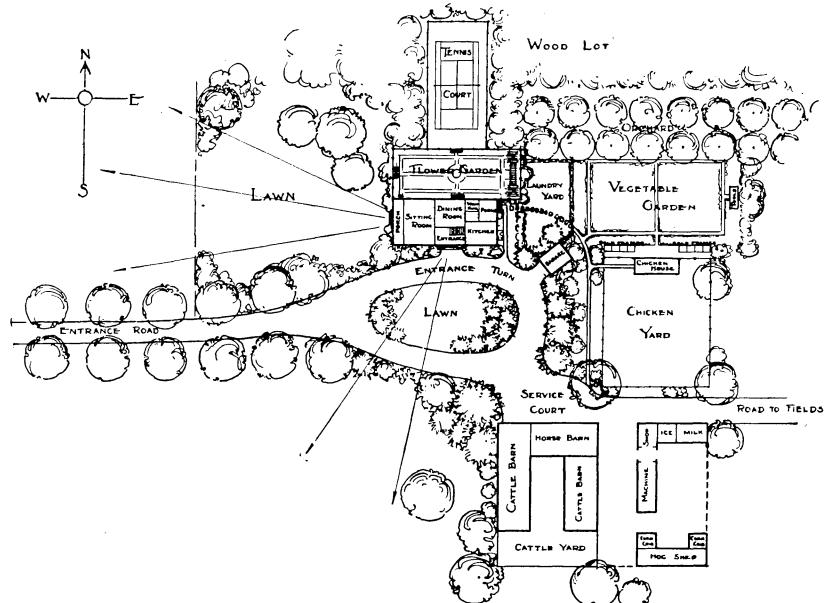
A plan for a farmstead where the buildings are back from a north-and-south road.
